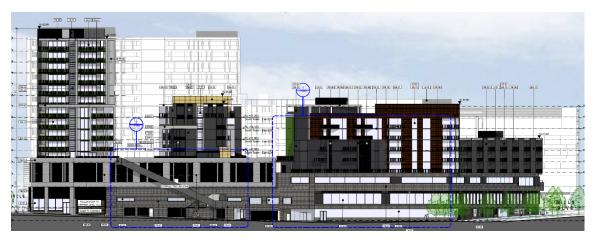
Previous amendment Nelmoore Lane (southern) elevation
